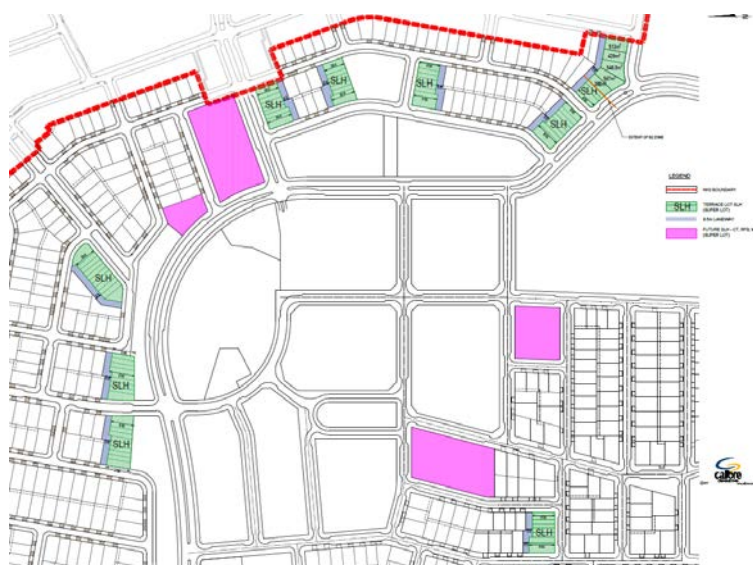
Indicative plan for the proposed small lot housing and 8.5m wide laneways
